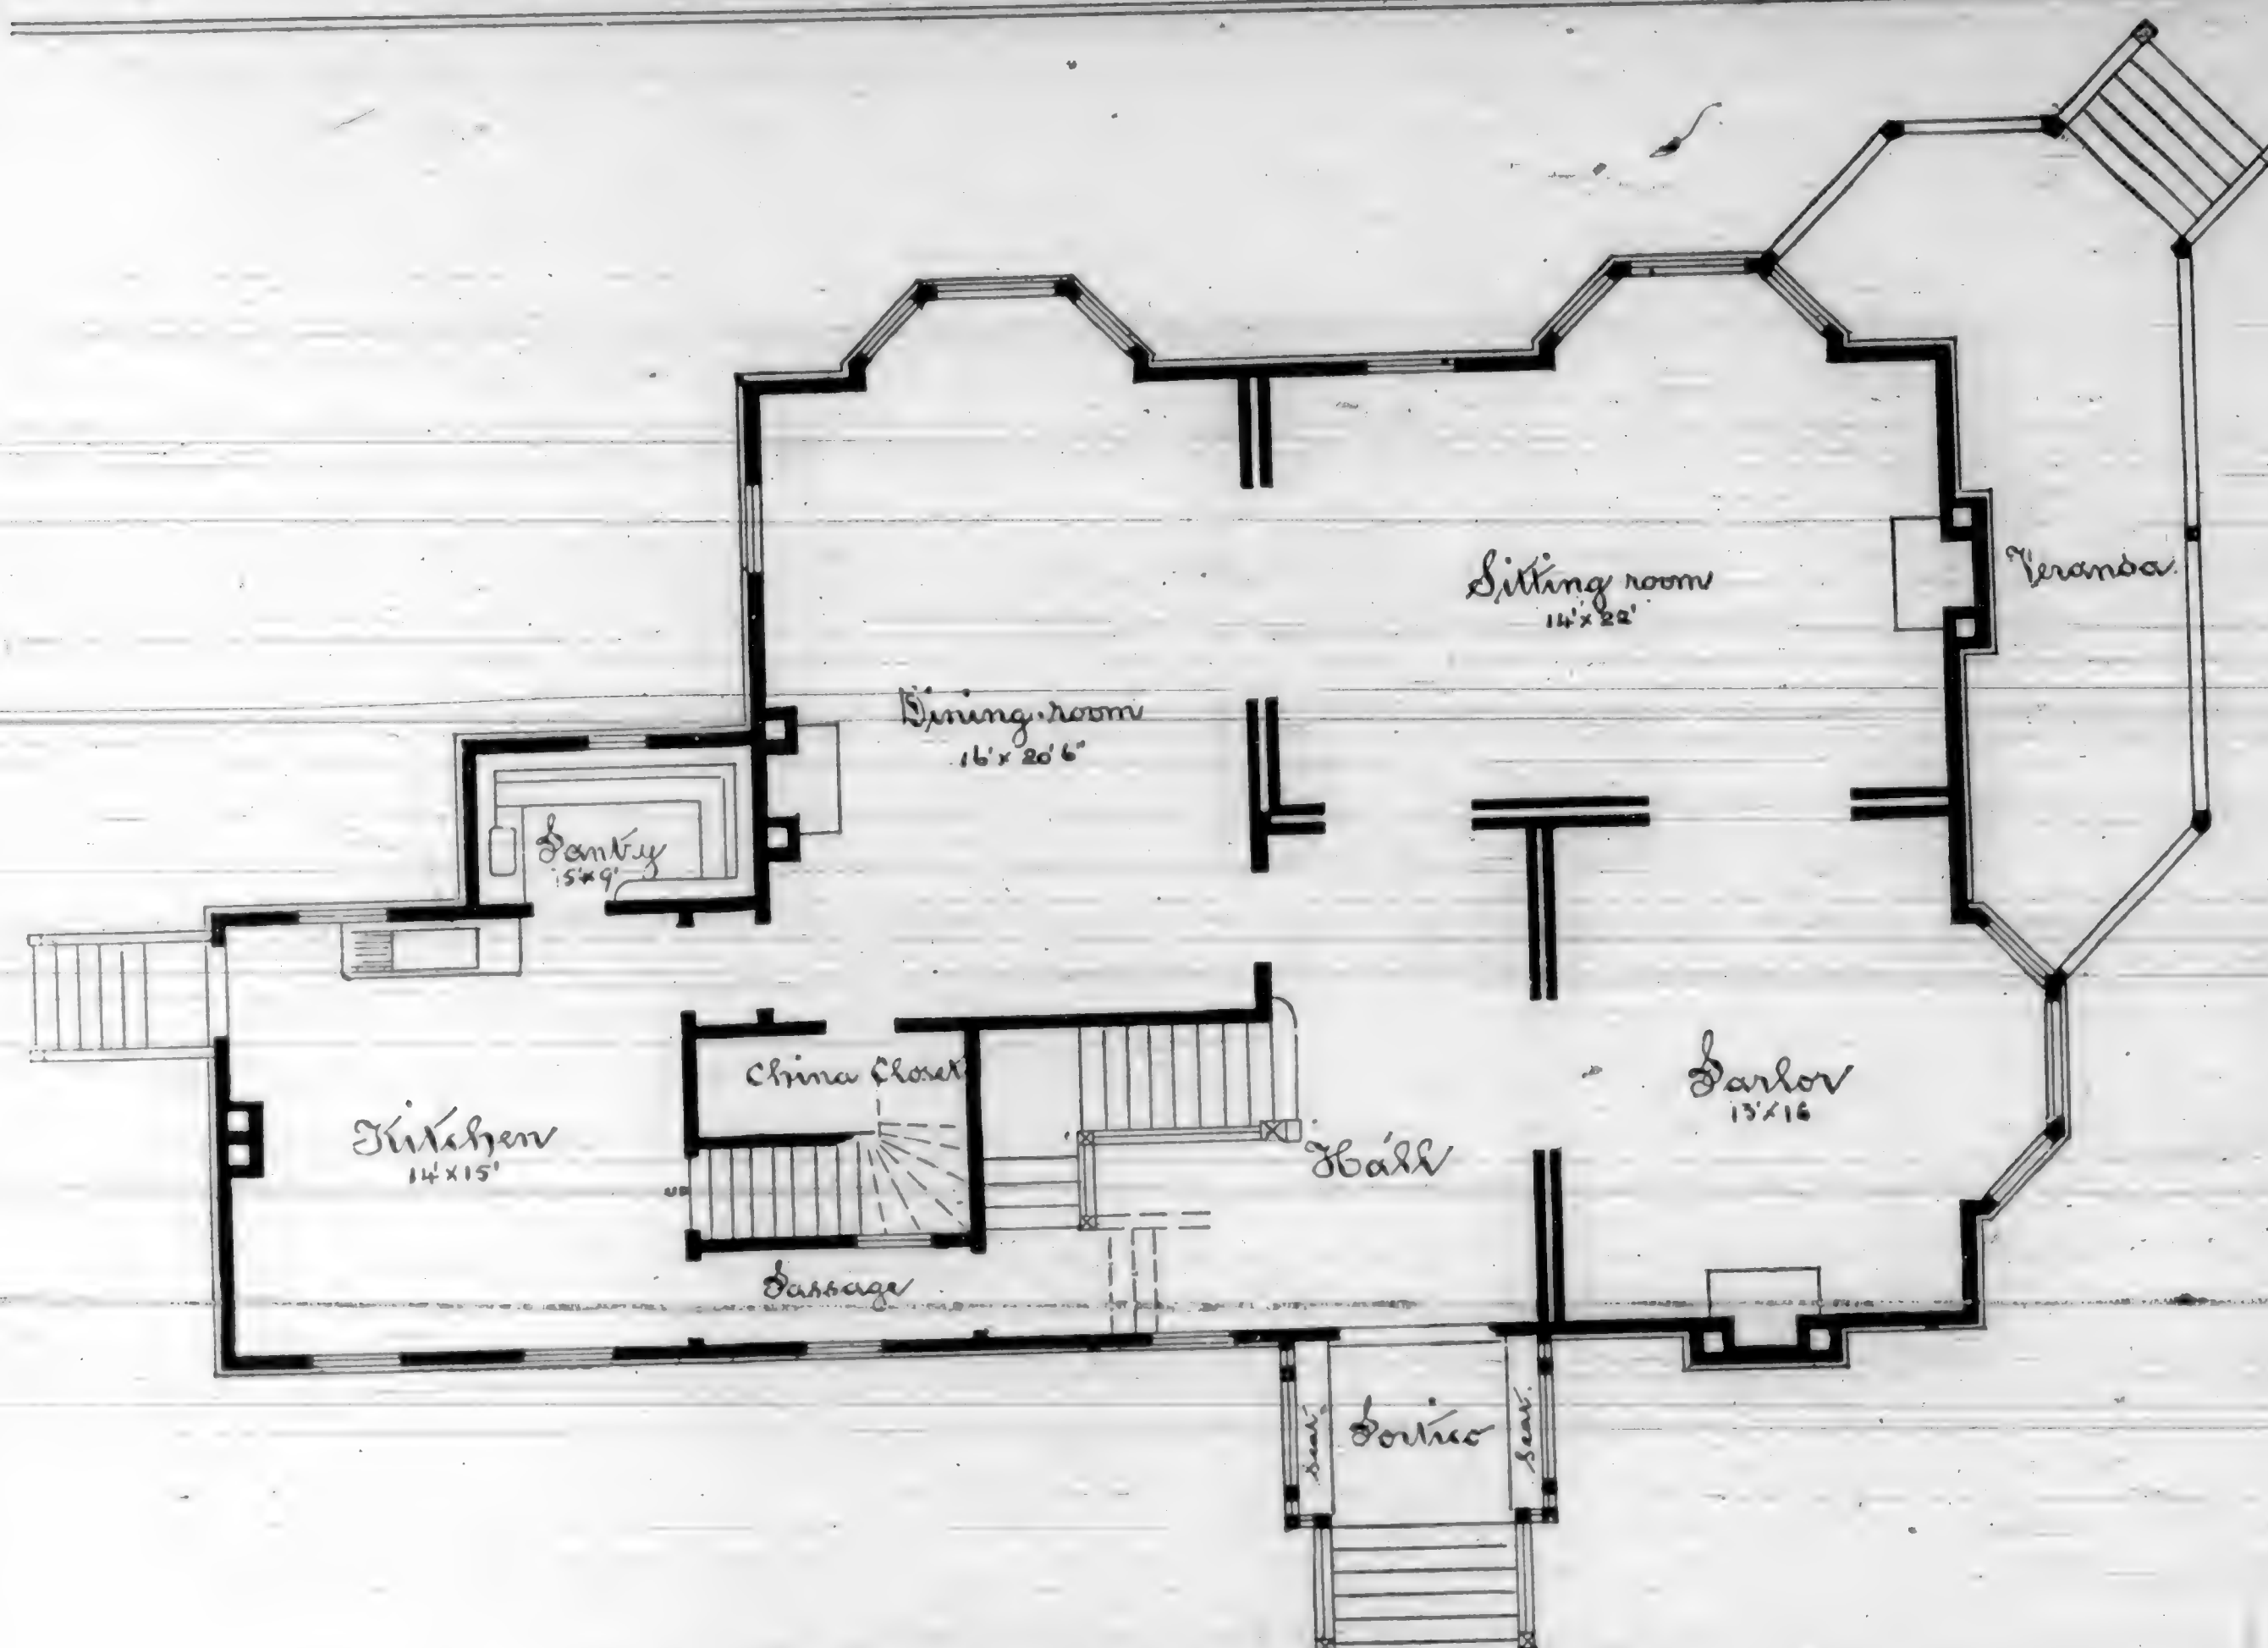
FIRST STORY PLAN OF \$10,000 DWELLING.
